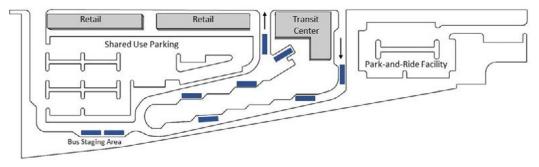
Conceptual transit center layout with adjacent park and ride facility and shared use parking in adjacent development.
